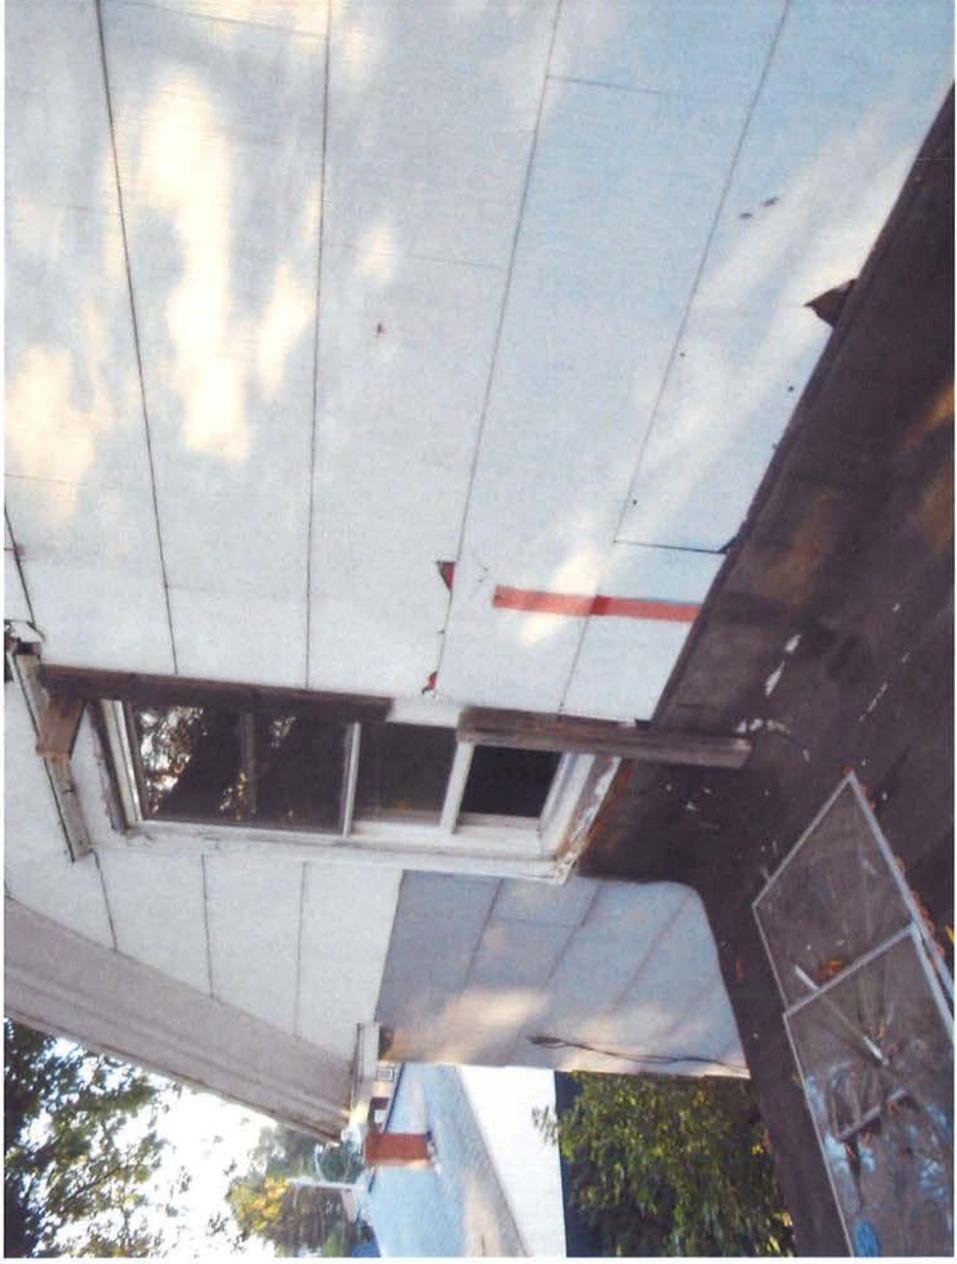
shows the remnants of a removed roove structure leaving exposed unrated material.
